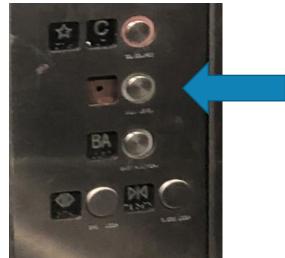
Vandalism to destination buttons at Civic Center Station street elevator, December 2021.
